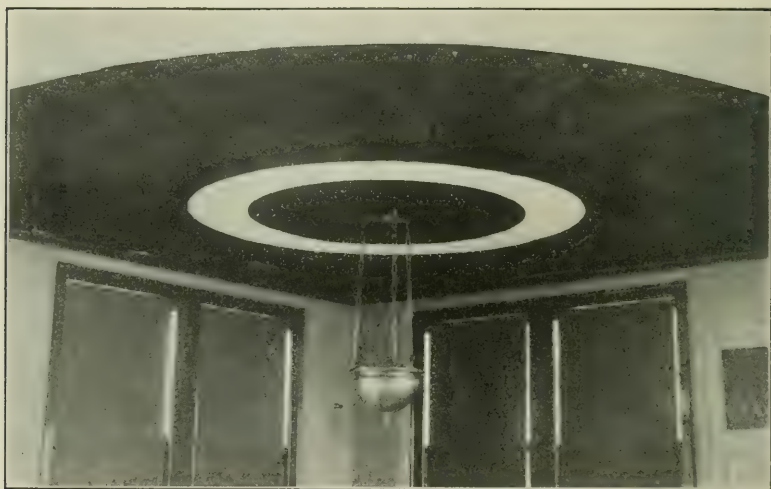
Ceiling zones and light-unit. Zone No. 5 white.
